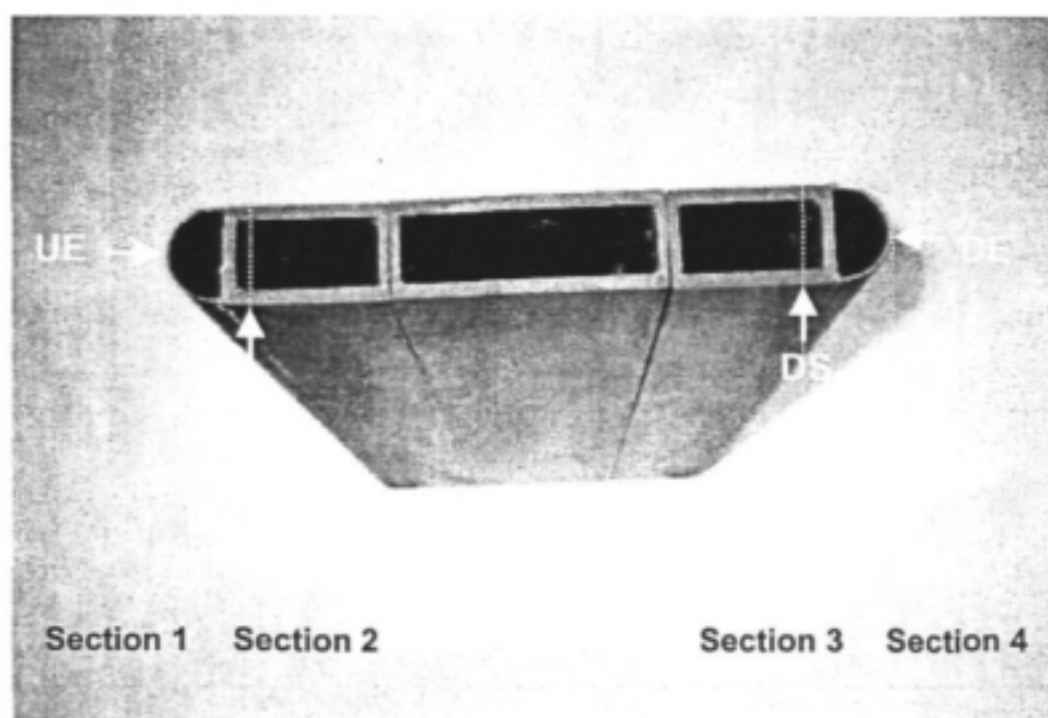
Defining sections 1,2,3 and 4 and measuring positions UE, US, DS and DE
